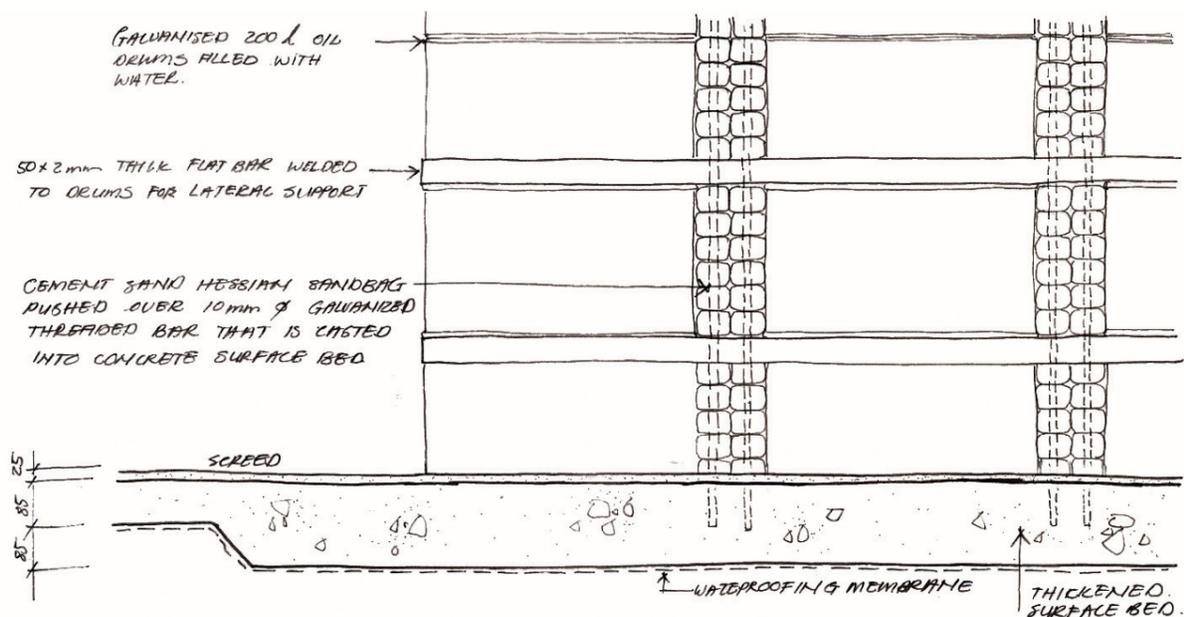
Sandbag and oil drum wall in Restaurant
